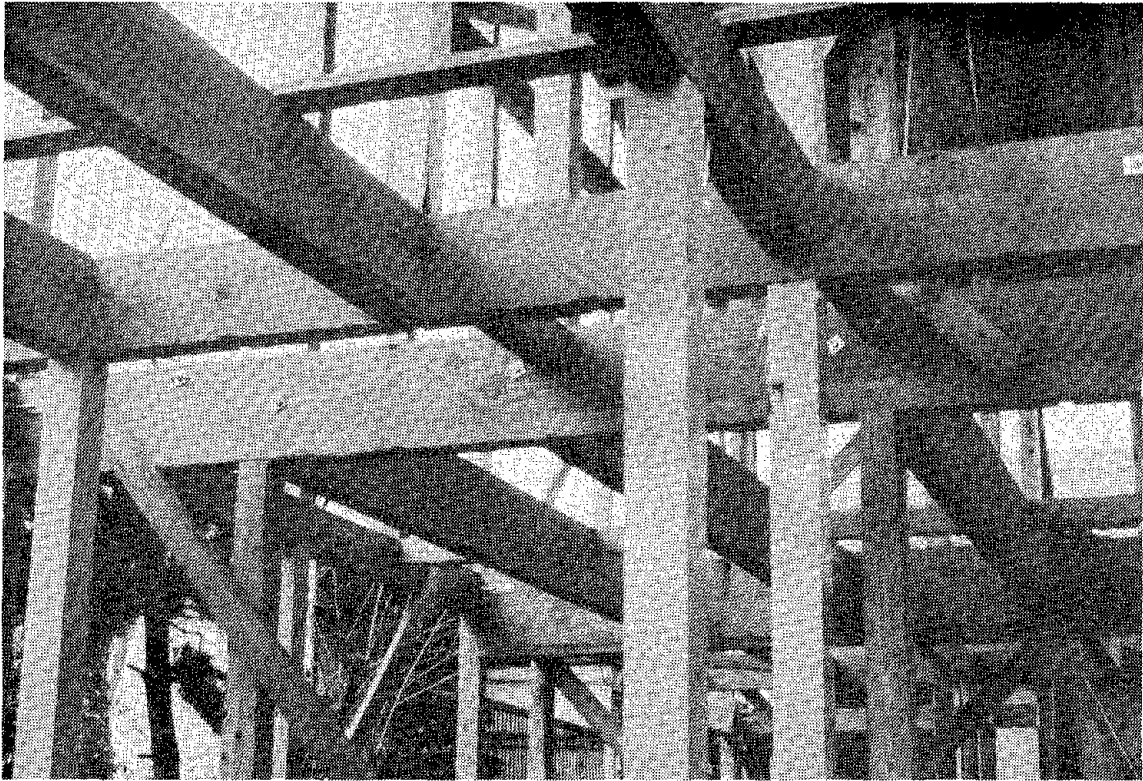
Wooden house under construction. Connections could be made more secure with greater use of metal fasteners.
